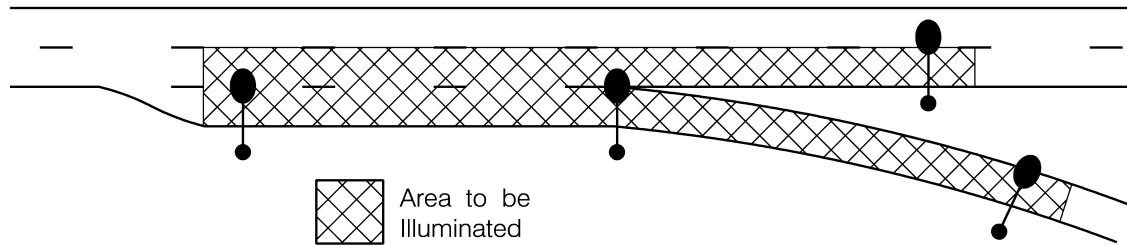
Simple Intersection, Typical Lighting Layout and Area to be Illuminated
